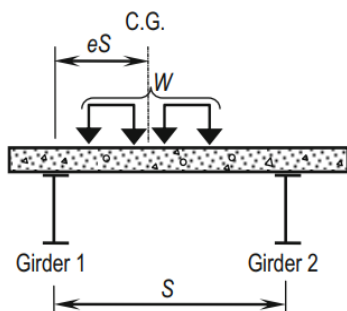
Slab and Beam Girder (Bakht and Mufti 2015)
